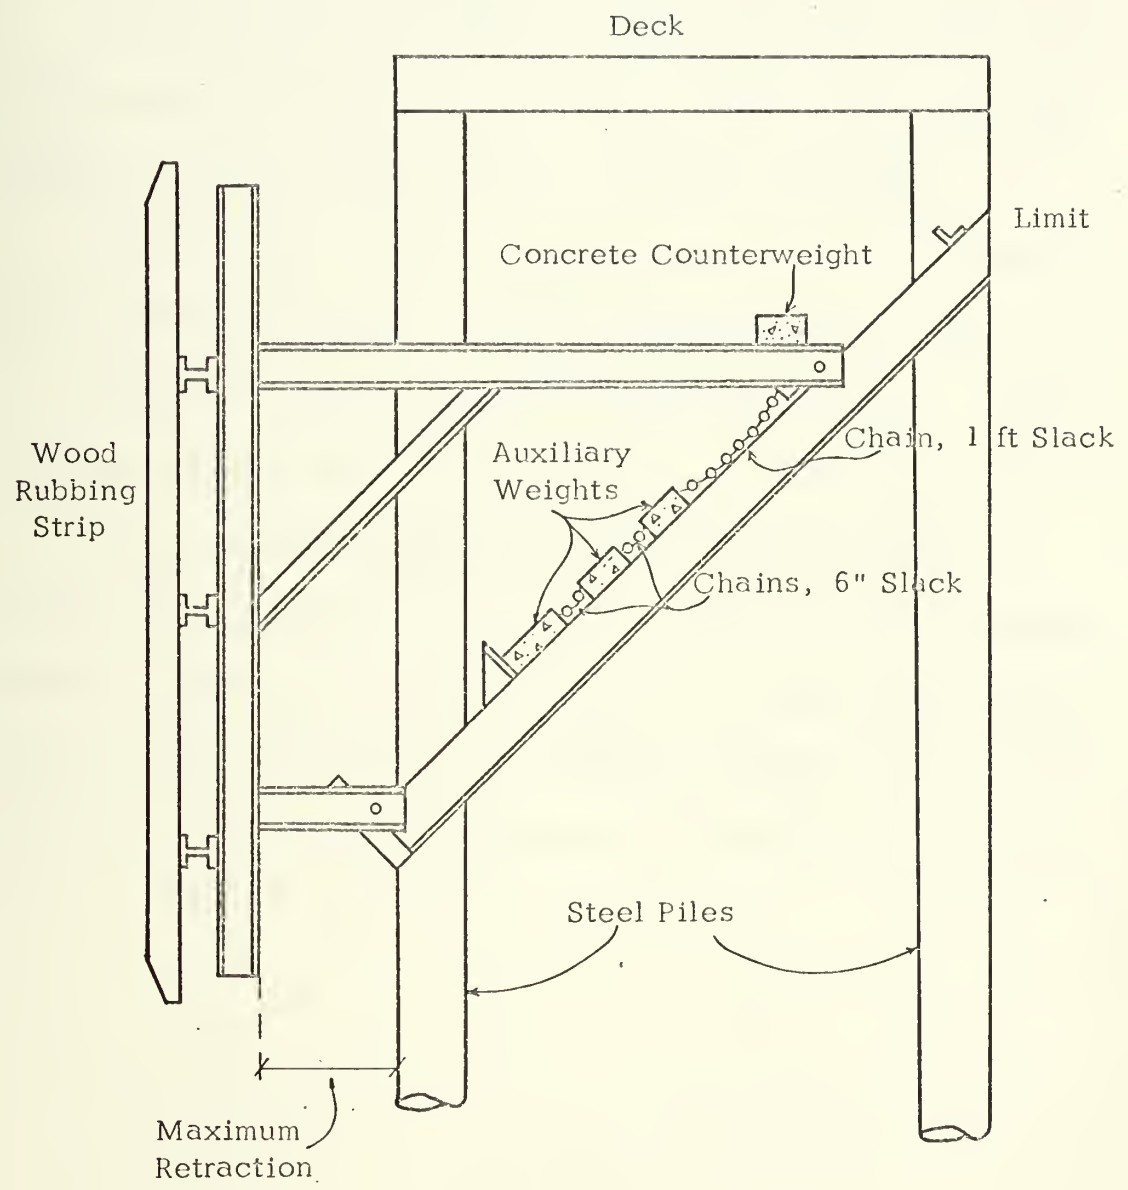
RETRACTABLE FENDER SYSTEM, BLANCATO TYPE
